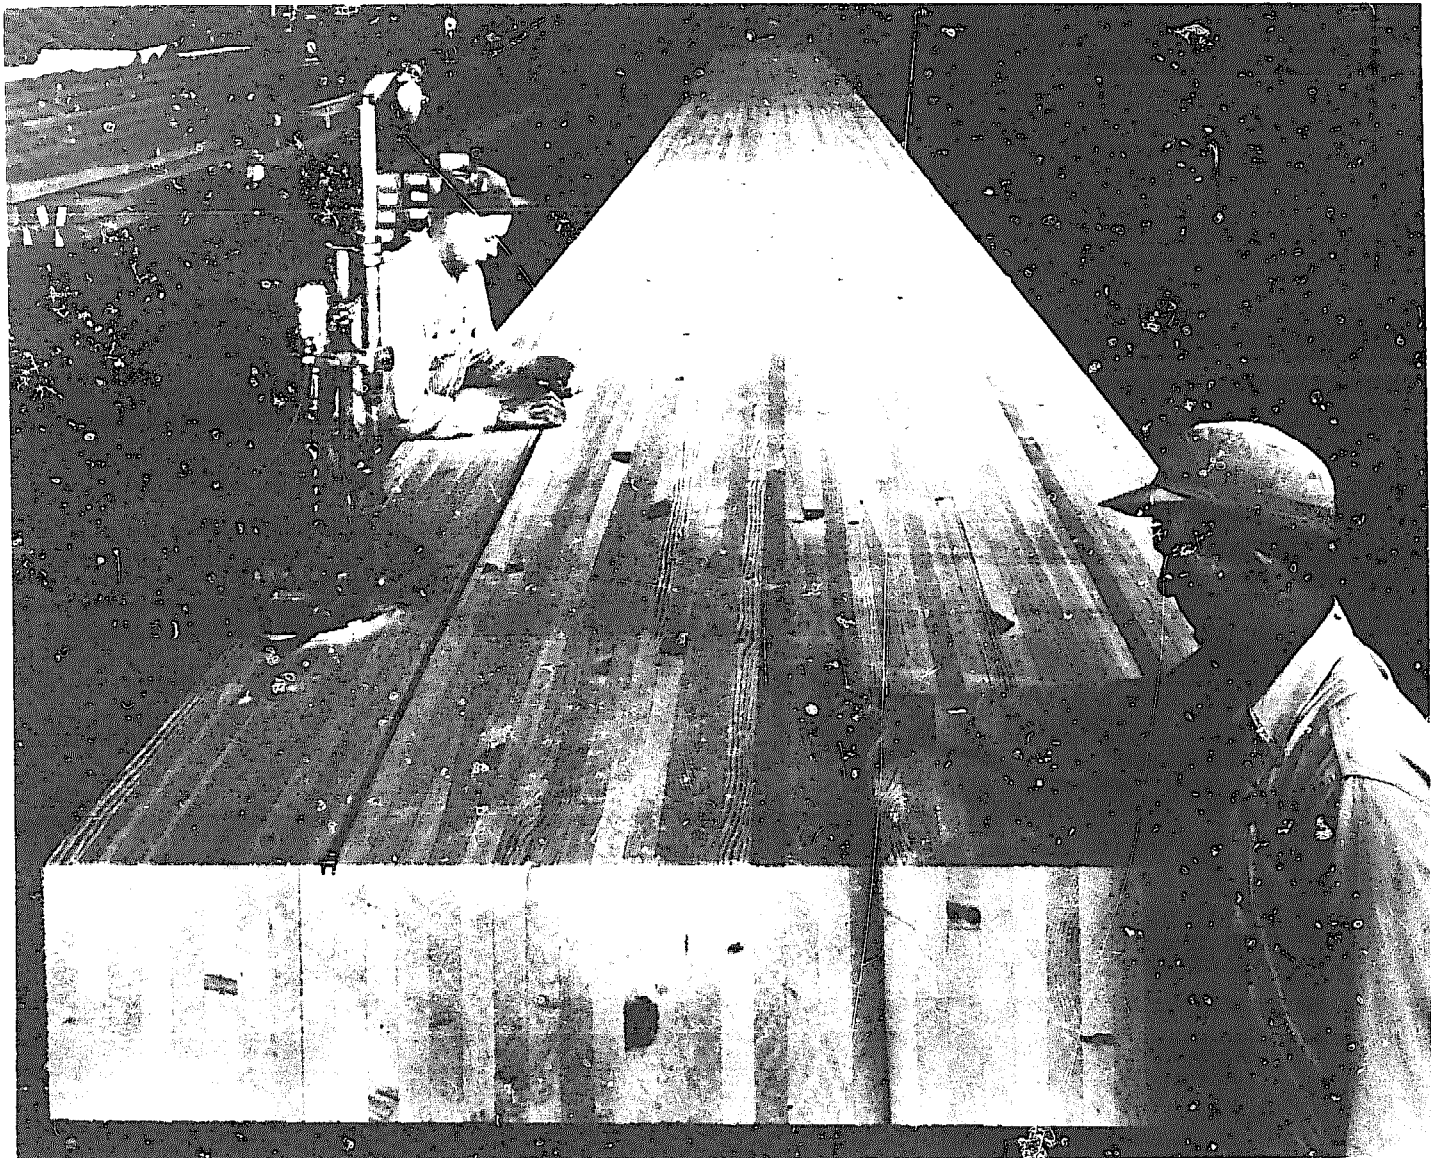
Heavy laminated timber, glued from 44 nominal 2-inch laminations.
